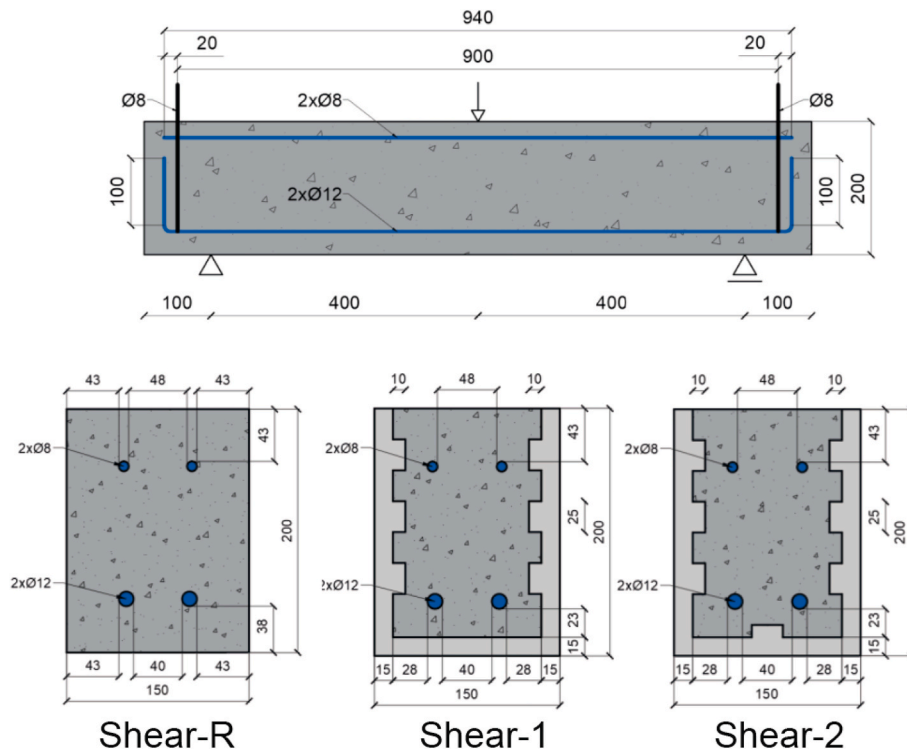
Design details of the beams for 3-point-bending test [unit in mm].
